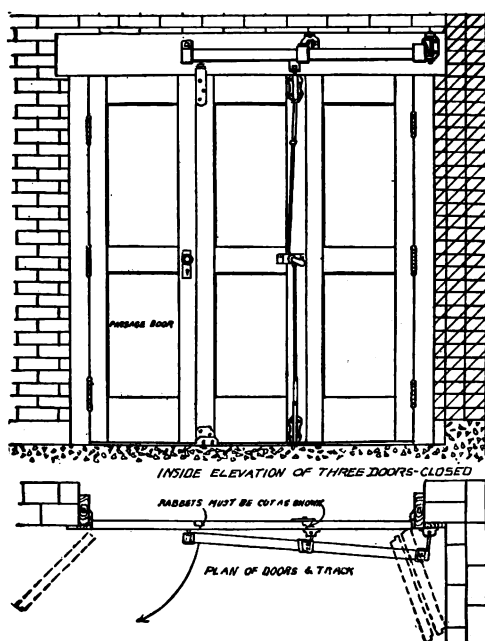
INSIDE ELEVATION OF THREE DOORS
